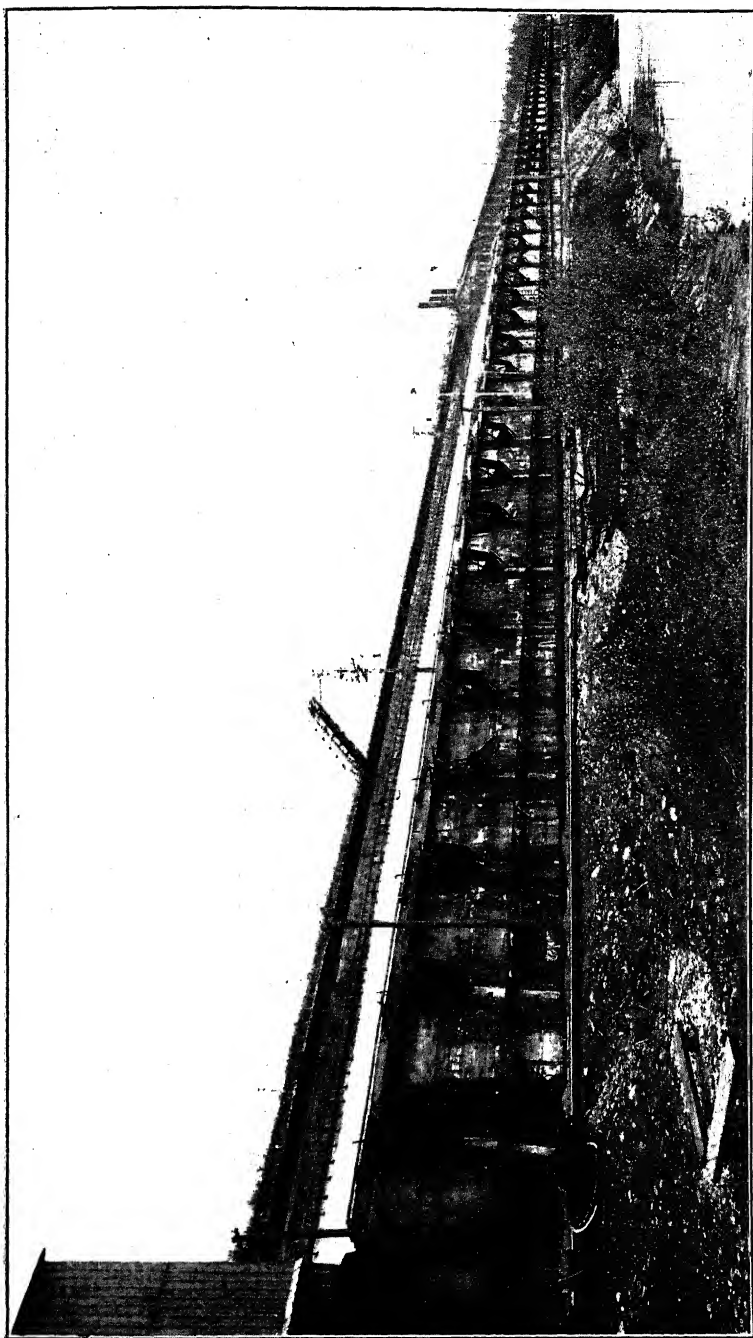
CONCRETE RETAINING-WALL WITH LOADING-CHUTES. HUDSONDALE STORAGE-PLANT.
